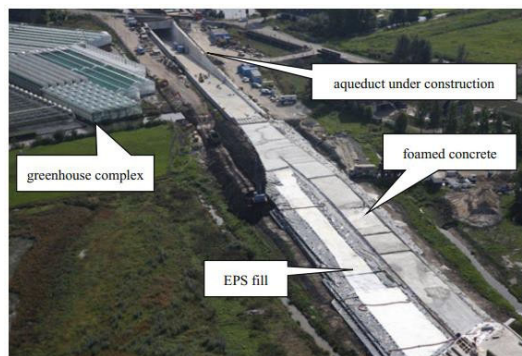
View of the N201 road embankment during construction with EPS geofoam [8]
